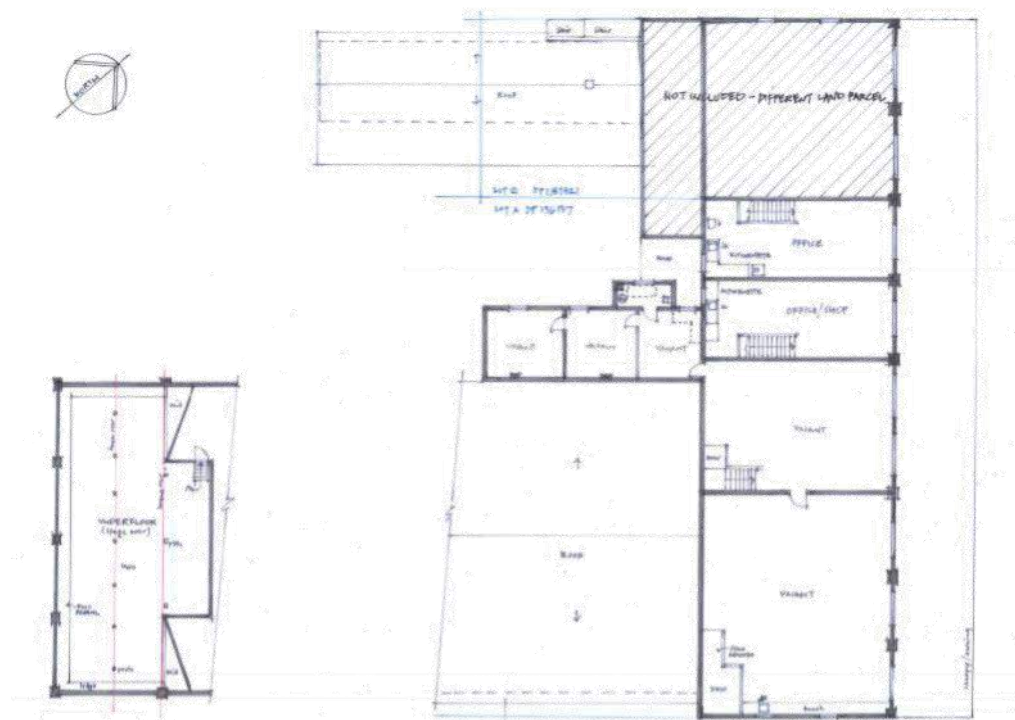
Understage & First Floor Plan for the Theatre Royal building – Noel Thomson Architecture
